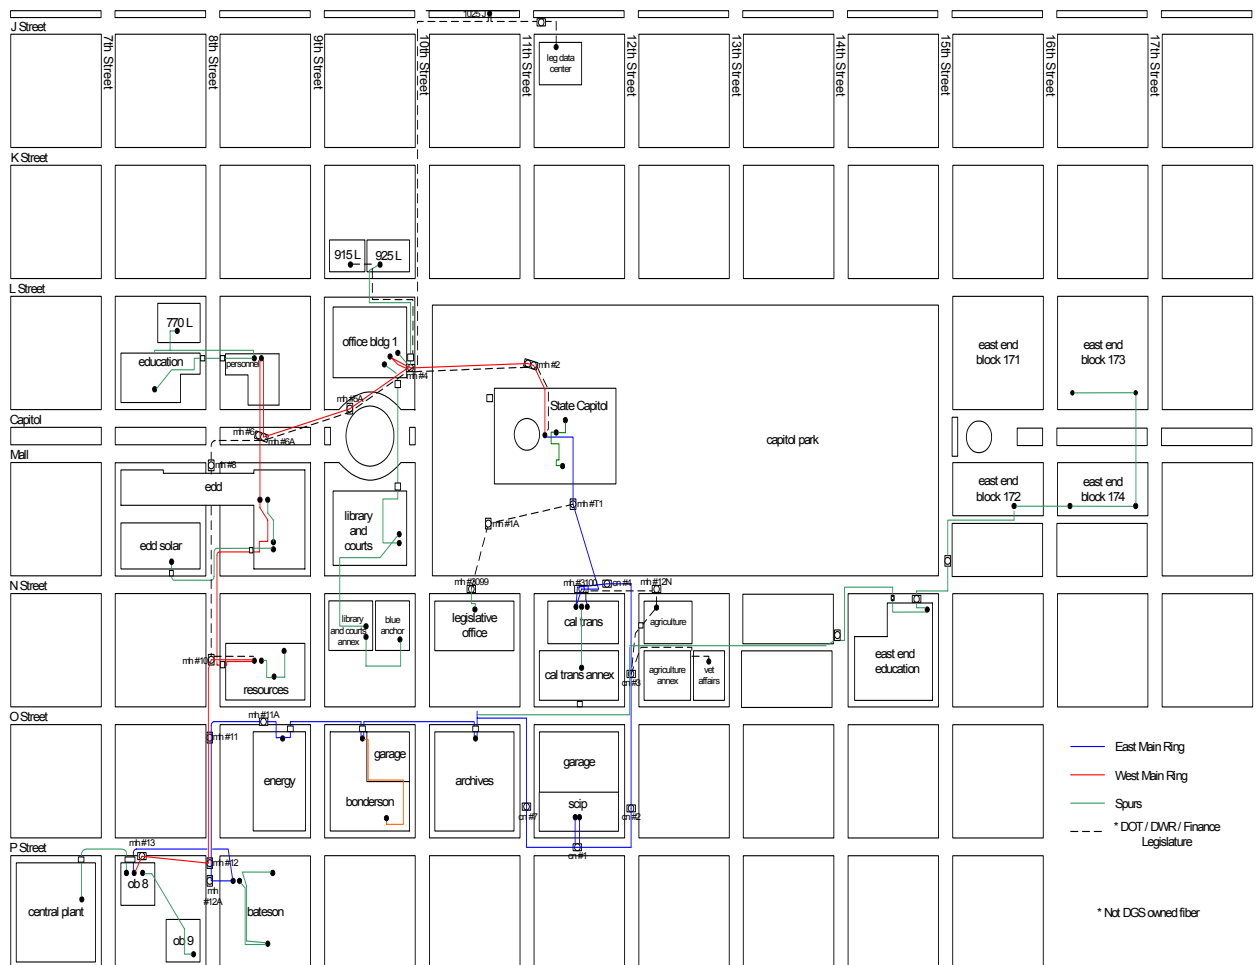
DGS Downtown Fiber Loop Facilities
